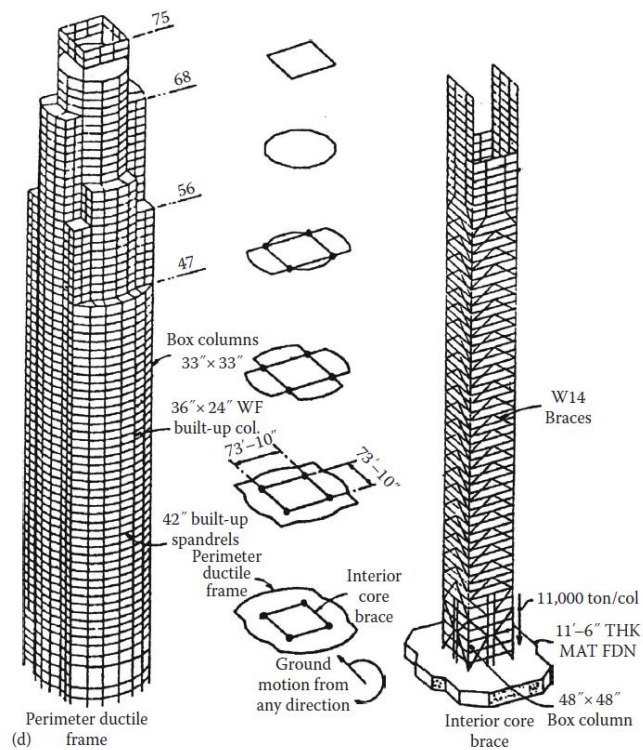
U.S. Bank Tower – Elevation View: Structural System (Taranath, 2011)
